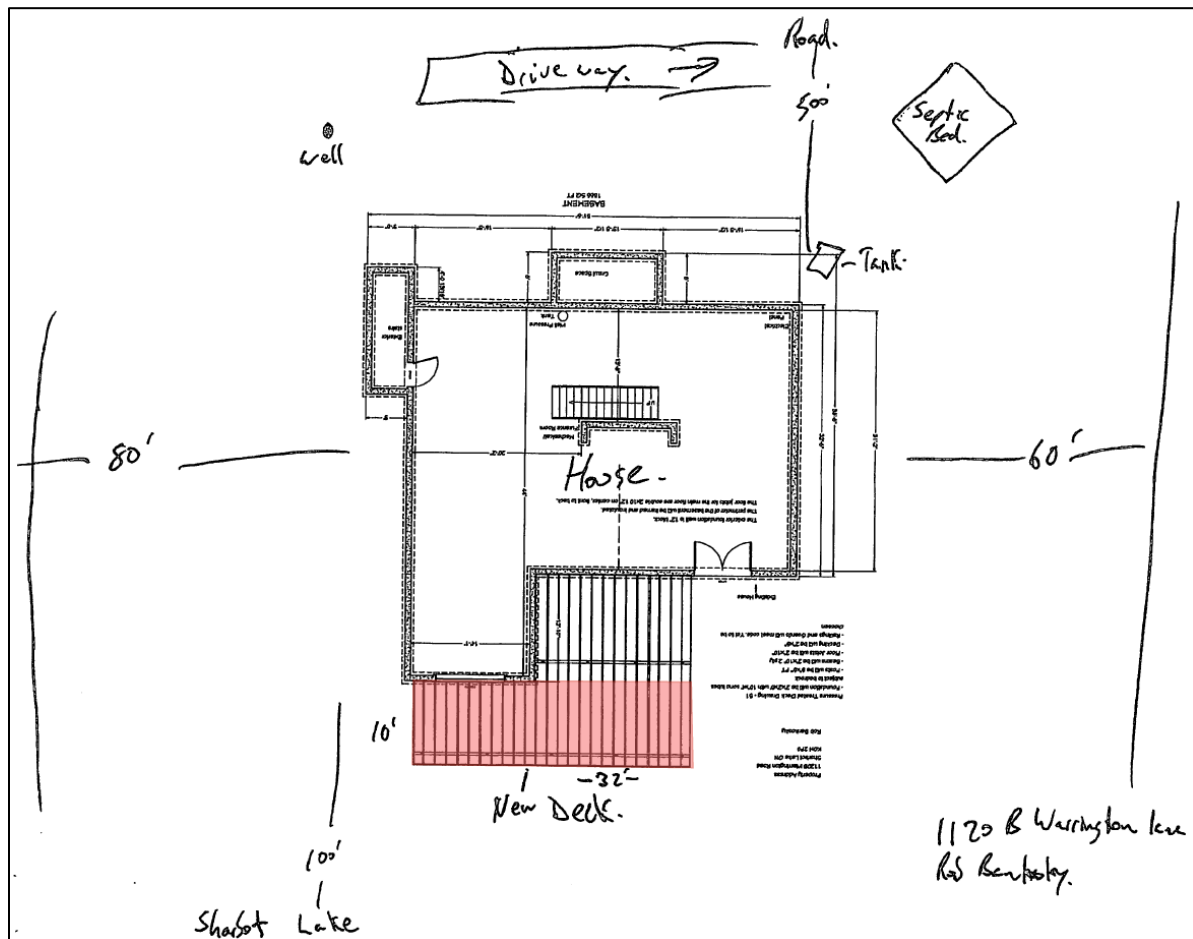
Plot plan submitted with the application showing the existing dwelling and attached deck including proposed addition. The deck proposed through this application is shown in red.
